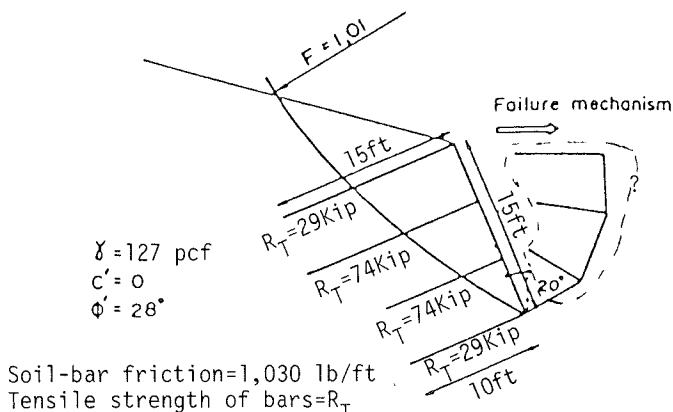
Eparris wall—analysis of failure using the slope stability design method. [Guilloux et al., 1983]
